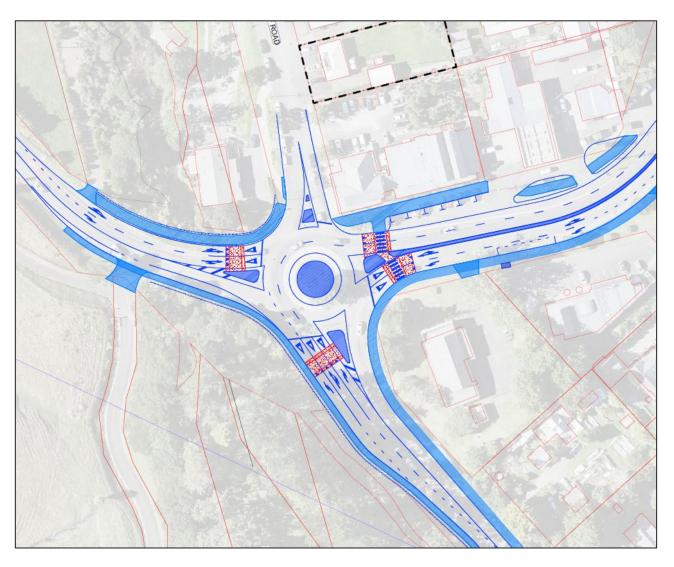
Proposed Upgrade to Whitford Maraetai Road / Whitford Road roundabout
